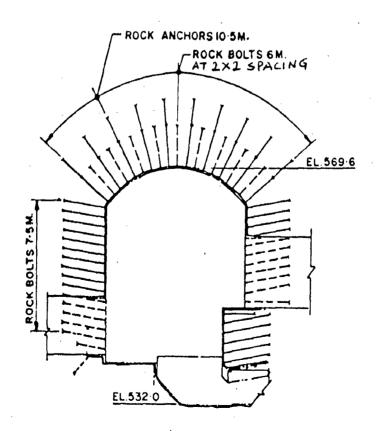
ROCK REINFORCEMENT IN CHAMERA POWER HOUSE
